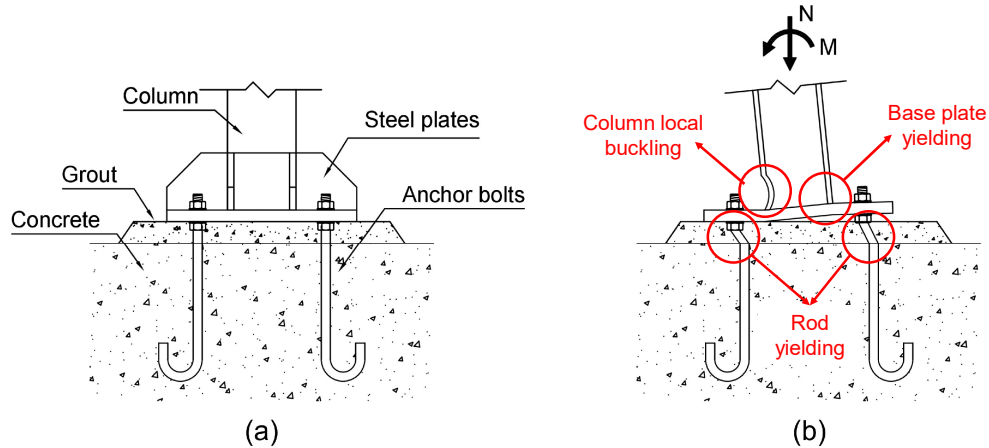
Conventional exposed column-base plate connection in steel frames: (a) typical layout; (b) possible failure mechanisms.
